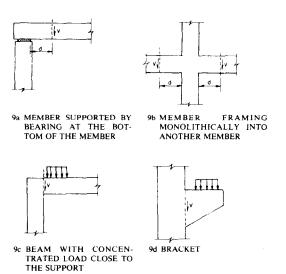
Typical Support Conditions for Loading Critical Sections for Shear
